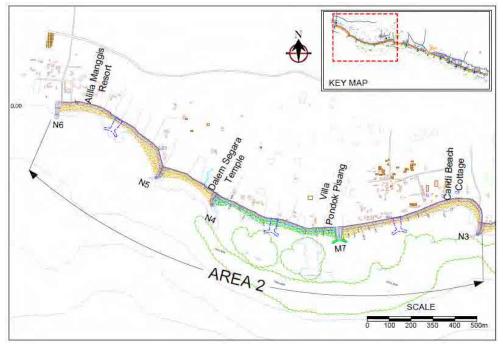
Layout Plan at Candidasa (Area 2, re-posted from Chapter 11)
